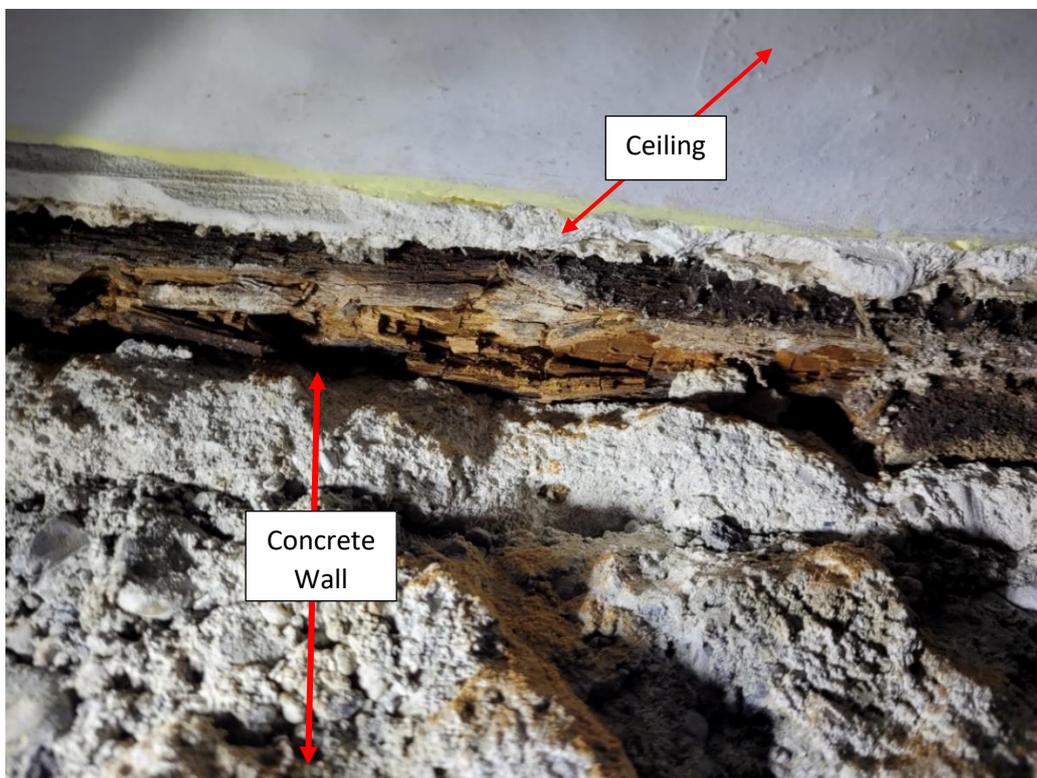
Showing an image of the above sketch where the plaster was removed. Note the concrete below and the plasterboard ceiling abutting the wallplate.
